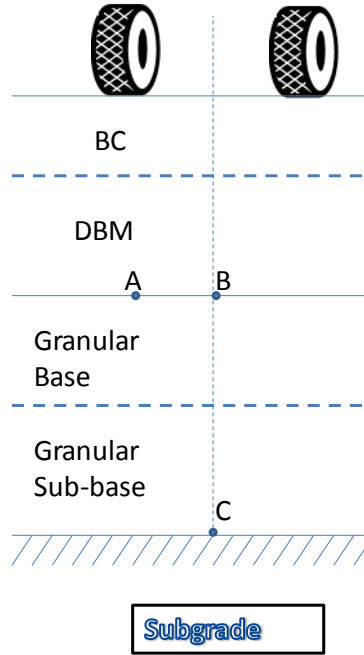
Typical Pavement Structure Used in Design Guide (IRC: 37-2001)
